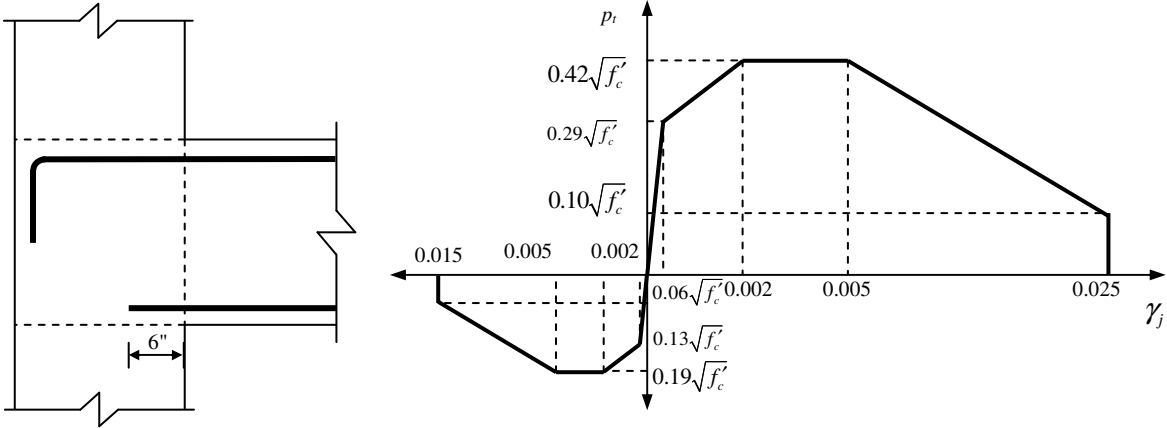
(a). Beam bar anchorage details Figure 3(b). Failure criteria (principal tensile stress-shear deformation)
